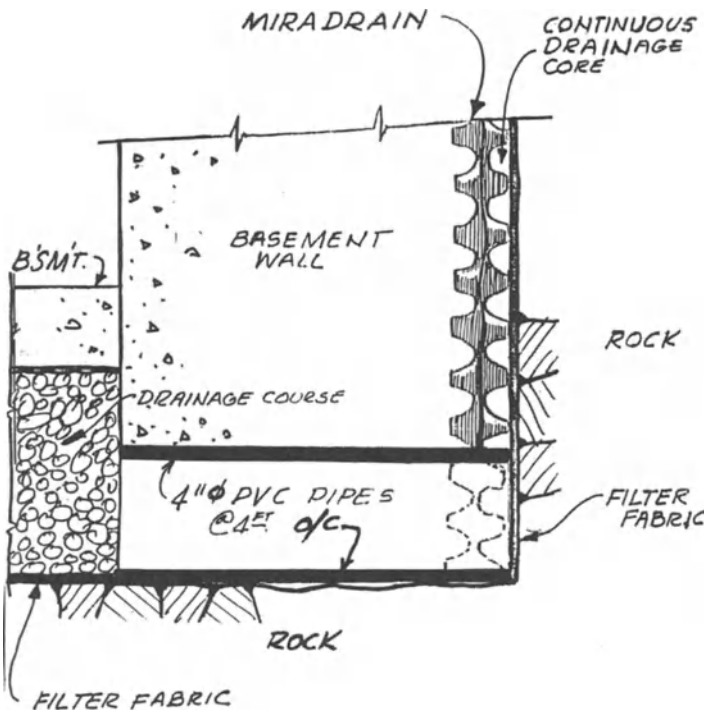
Detail at bottom of wall, showing how drainage core is formed when the wall concrete is cast
